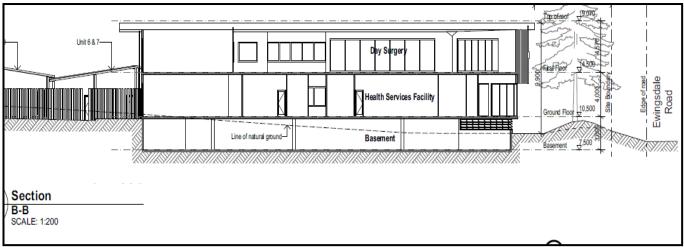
Section drawing showing proposed three storey component and earth mound adjacent to Ewingsdale Road
